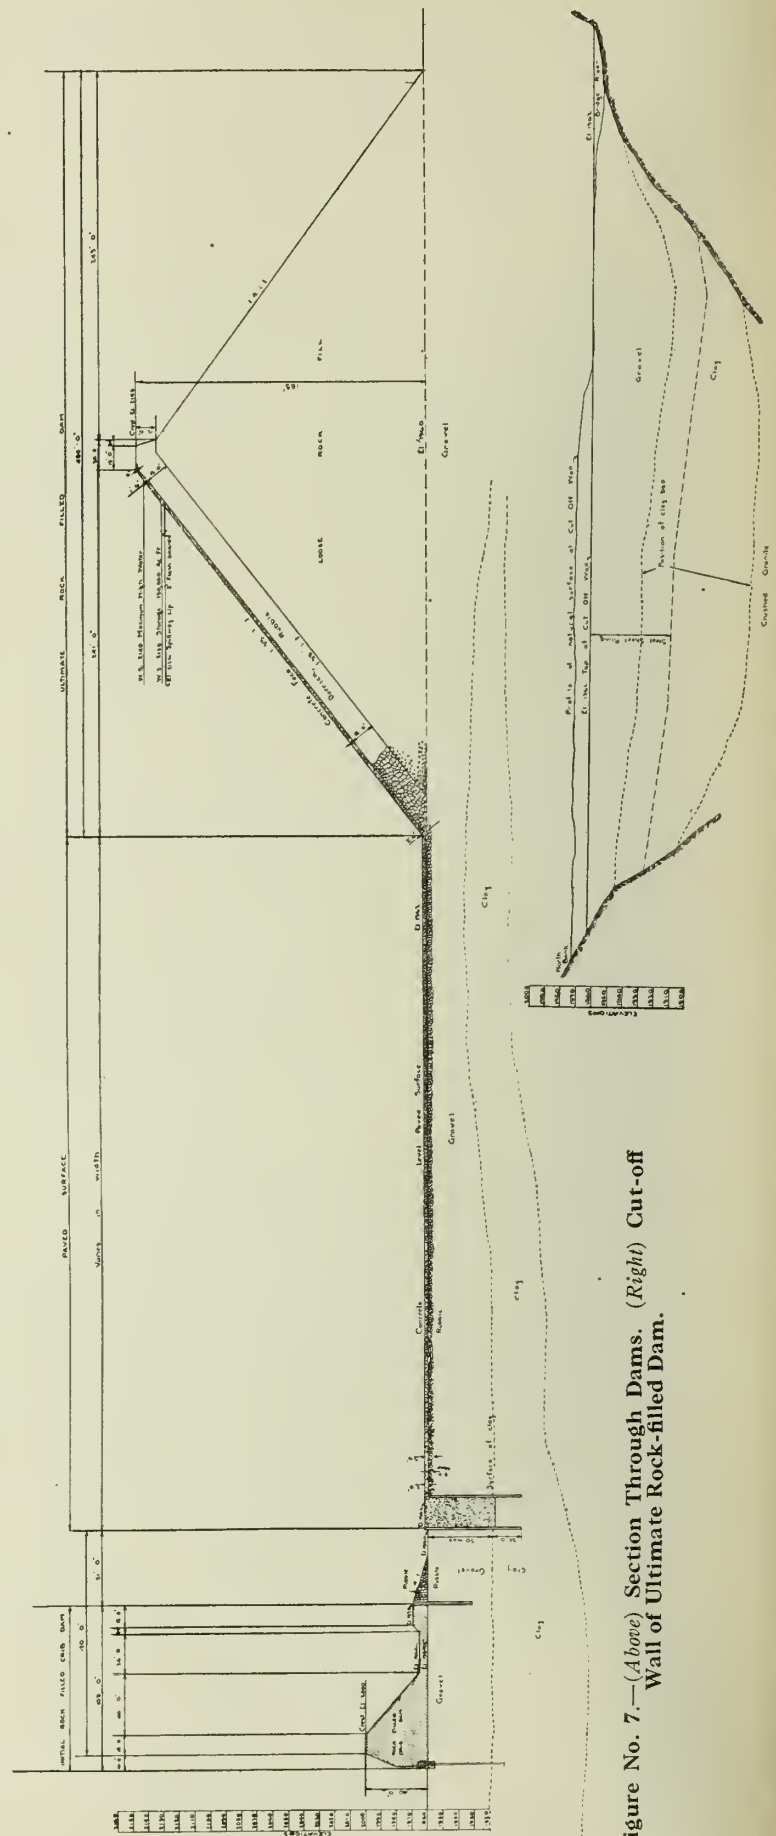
(Above) Section Through Dams. (Right) Cut-off Wall of Ultimate Rock-filled Dam.
